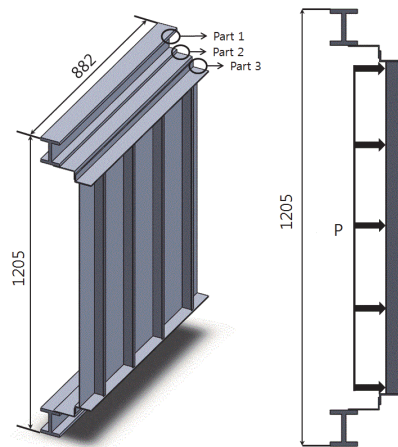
Dimensions of blast structures with stiffened plate shapes
